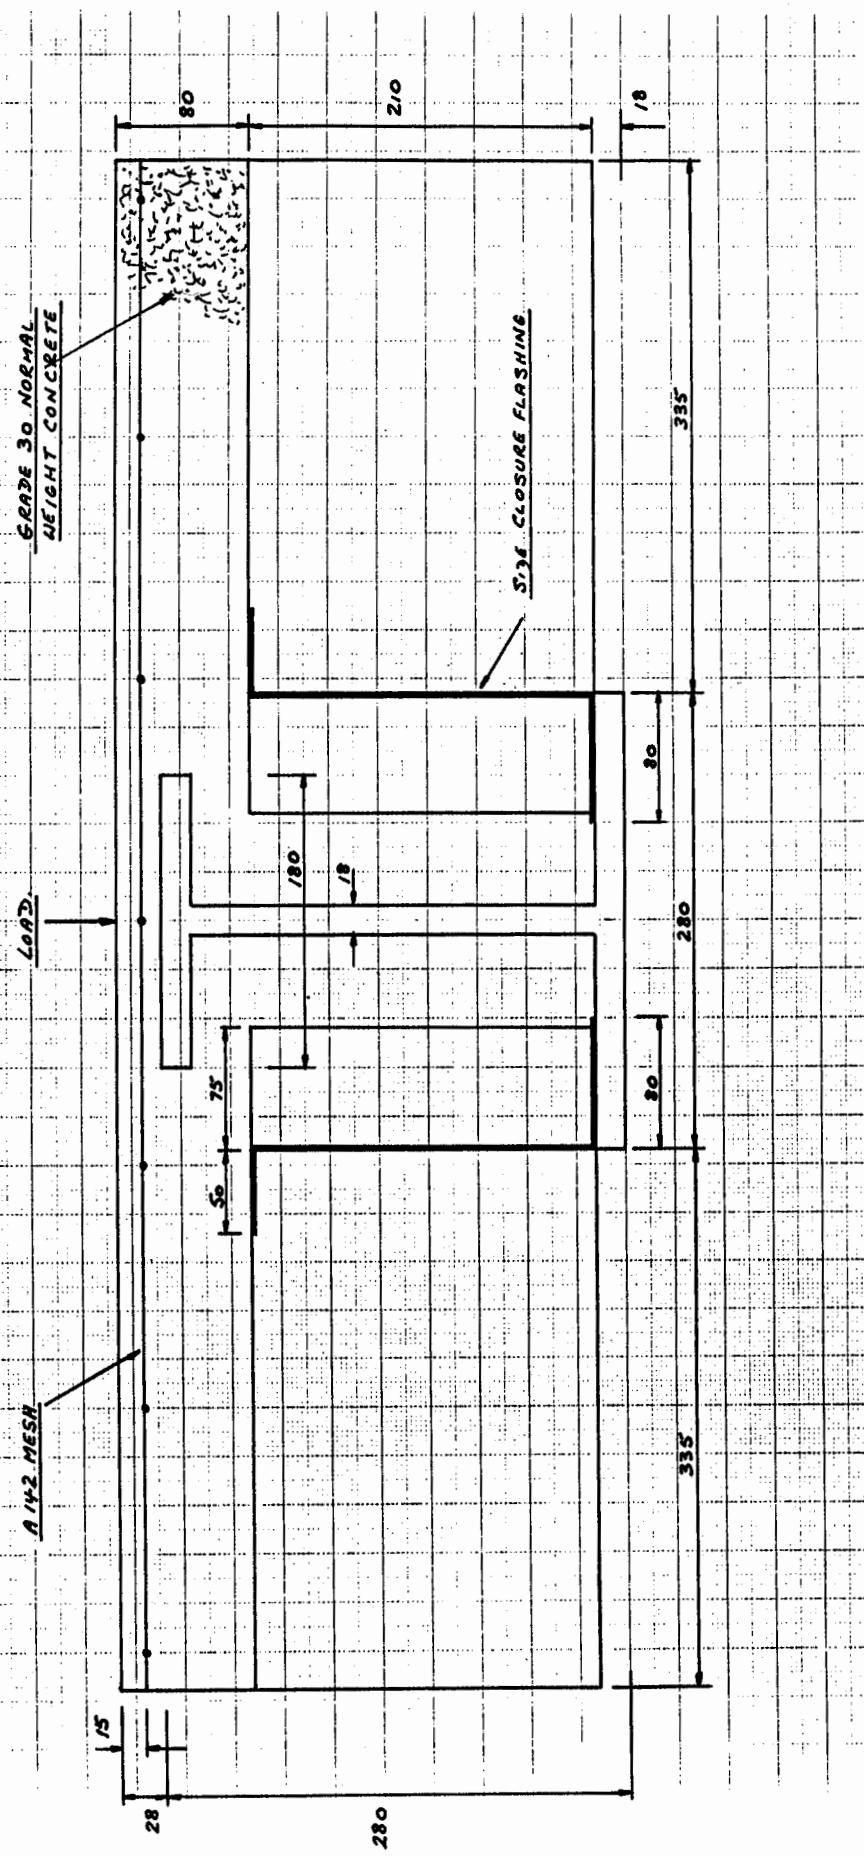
GENERAL ARRANGEMENT OF THE TEST ASSEMBLY
